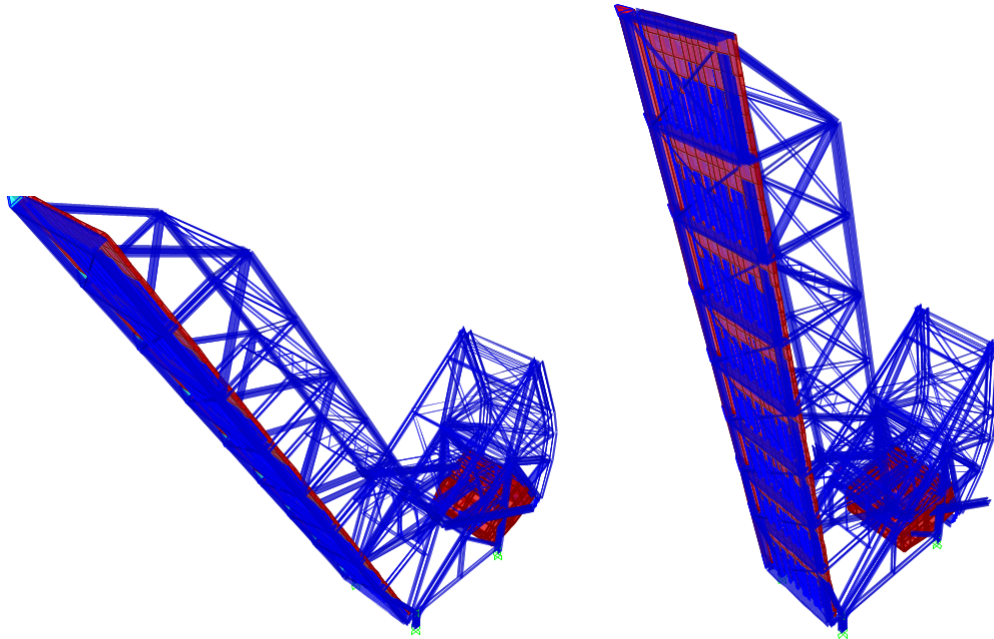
Screenshot of LaSalle Causeway Bascule Bridge CSI Bridge Finite Element Model at 63o and 84o opening, from 2017 Structural Evaluation
